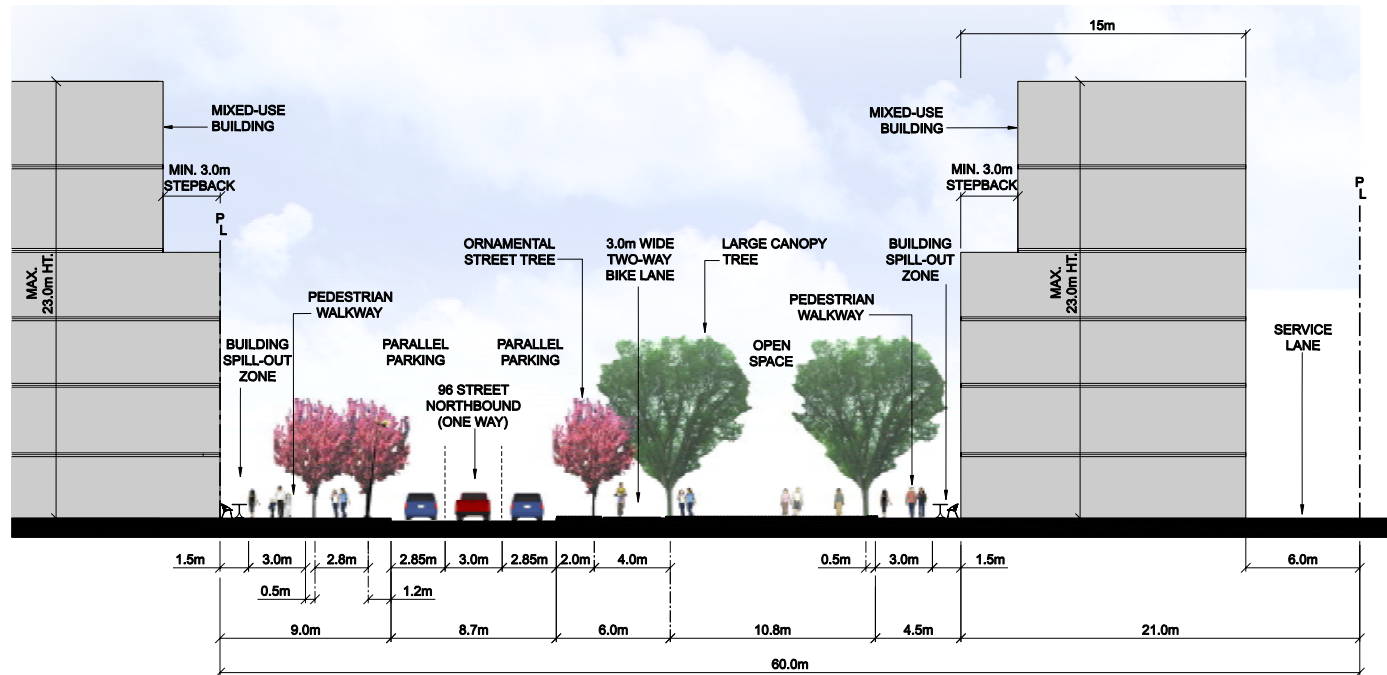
Section: Possible built form of 96 Street from 103 Avenue to 103A Avenue
